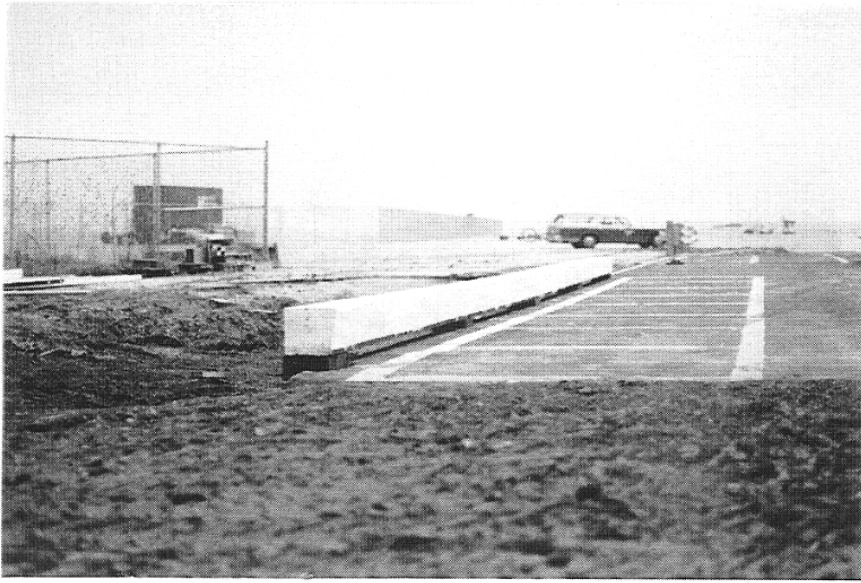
Trapezoidal-Shape Timber Curb Rail, Test LVCT-1c
